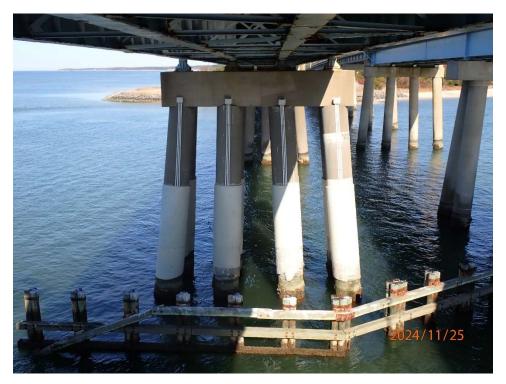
FIBSB Substructure with pile jacket and fender system with broken top wale and portions of lower wale within small navigation channel.
